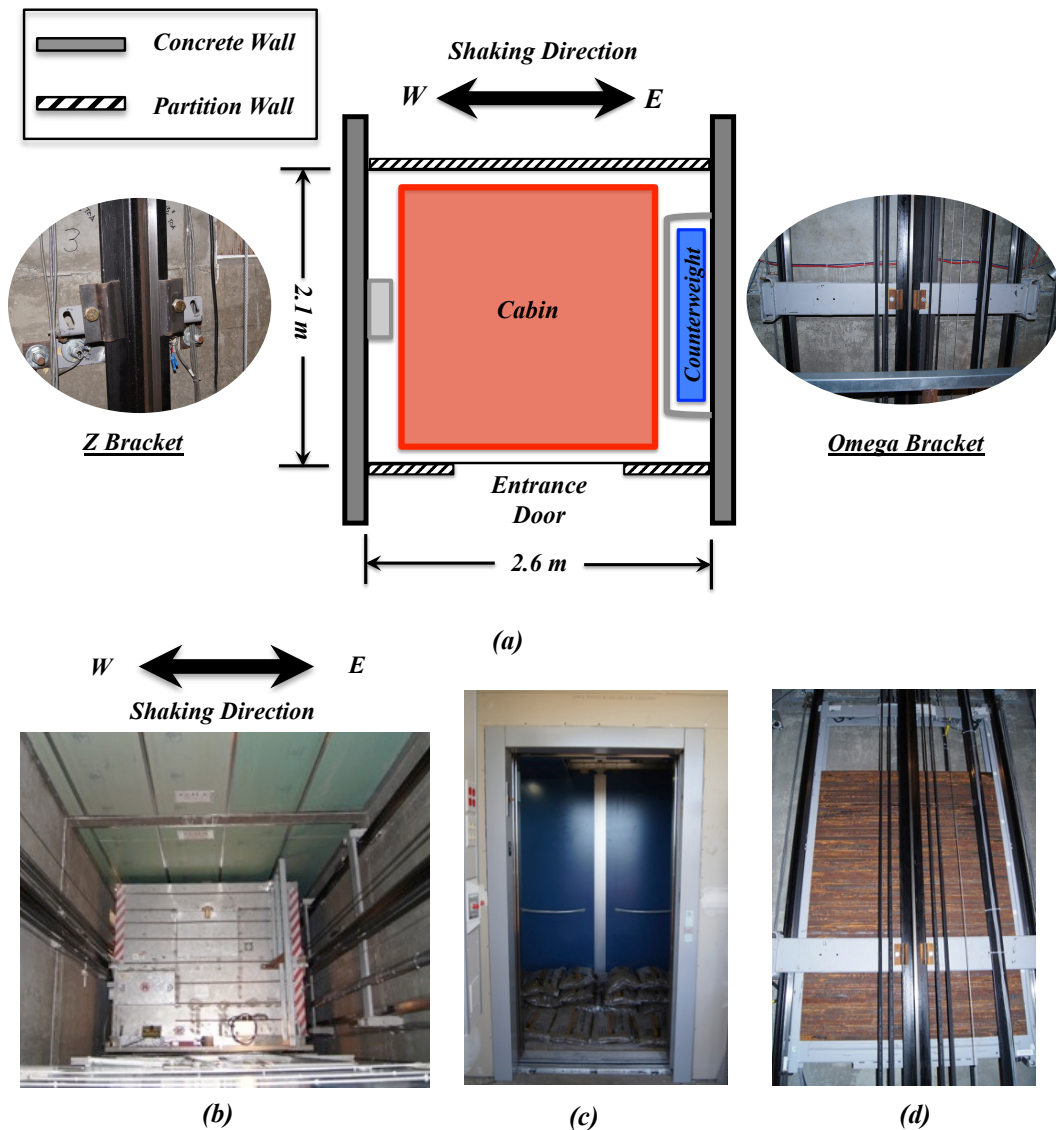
Elevator hoistway: (a) plan layout, (b) photograph (view down from level 3), (c) cabin with sand bags, and (d) counterweight.
